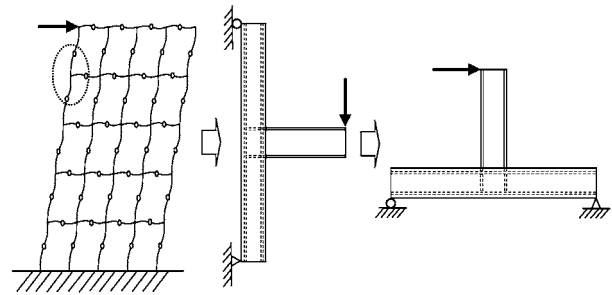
Test specimen simulating an exterior steel beam-to-SRC column connection subjected to lateral load
